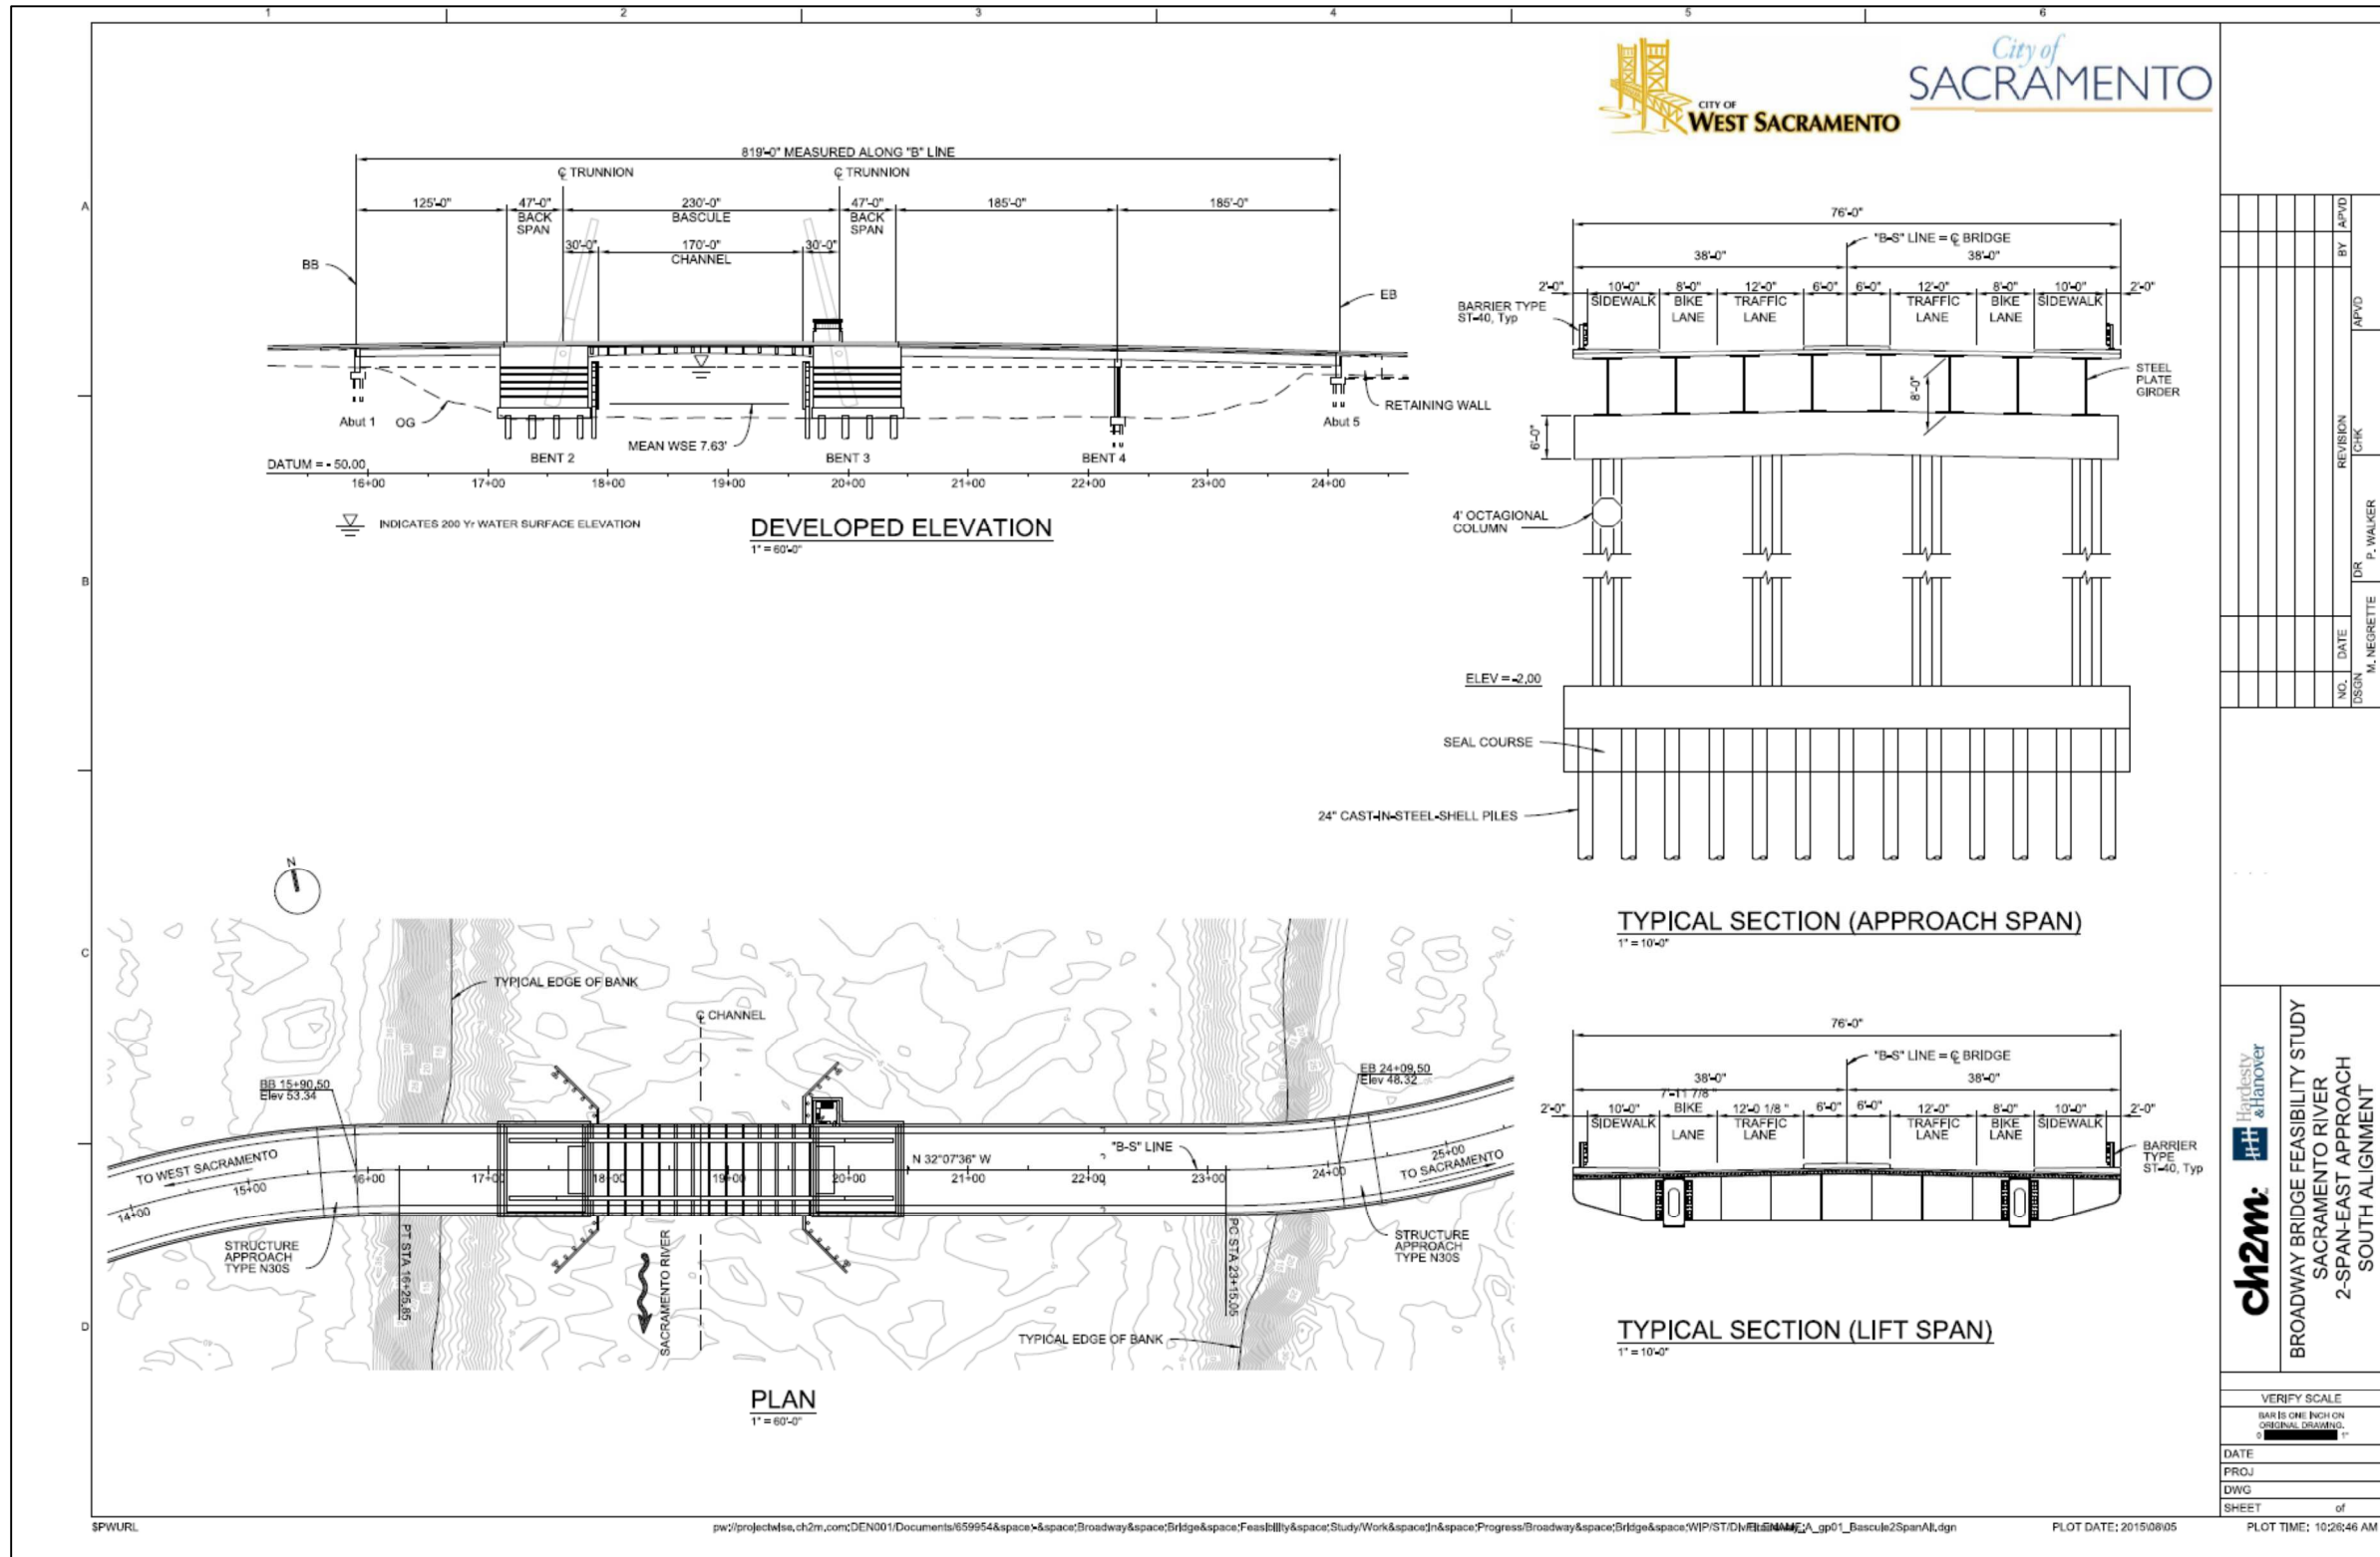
Proposed Bridge General Plan, Double-Leaf Bascule Bridge
